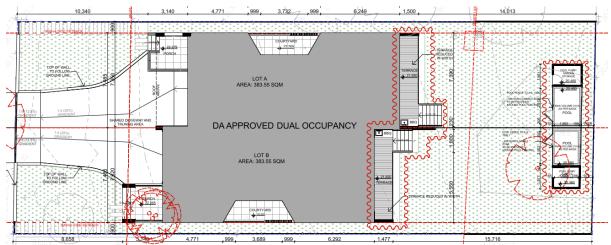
Extract of the proposed site plan, drawing # A100, issue C, dated 01/07/2021.
